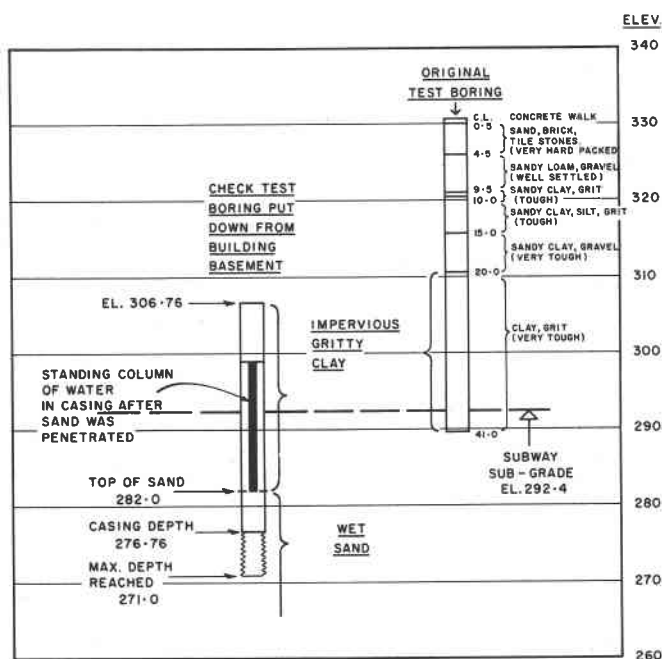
CROSS-SECTION THROUGH TEST BORING AT COLLEGE STREET
